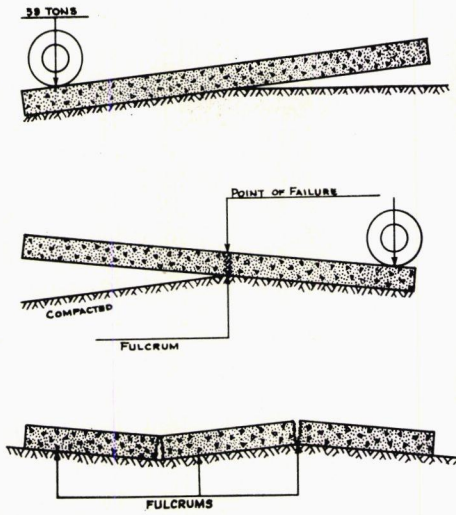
Theory of slab cracking to eliminate under-slab voids.
